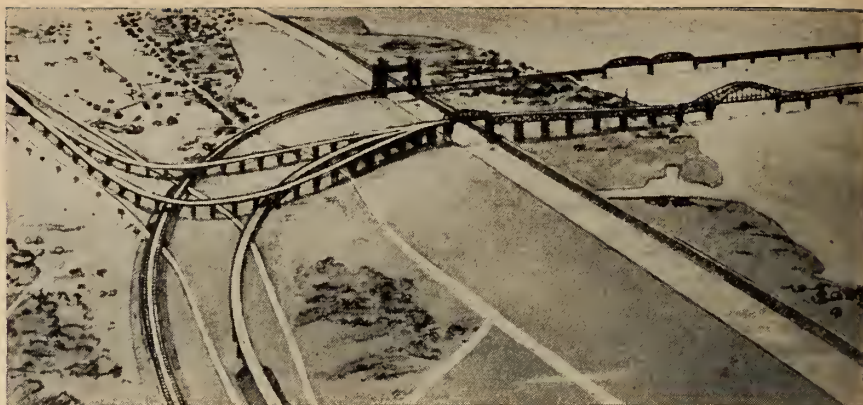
Revised Honore Mercier Bridge south approach and new Caughnawaga railway vertical lift span.
